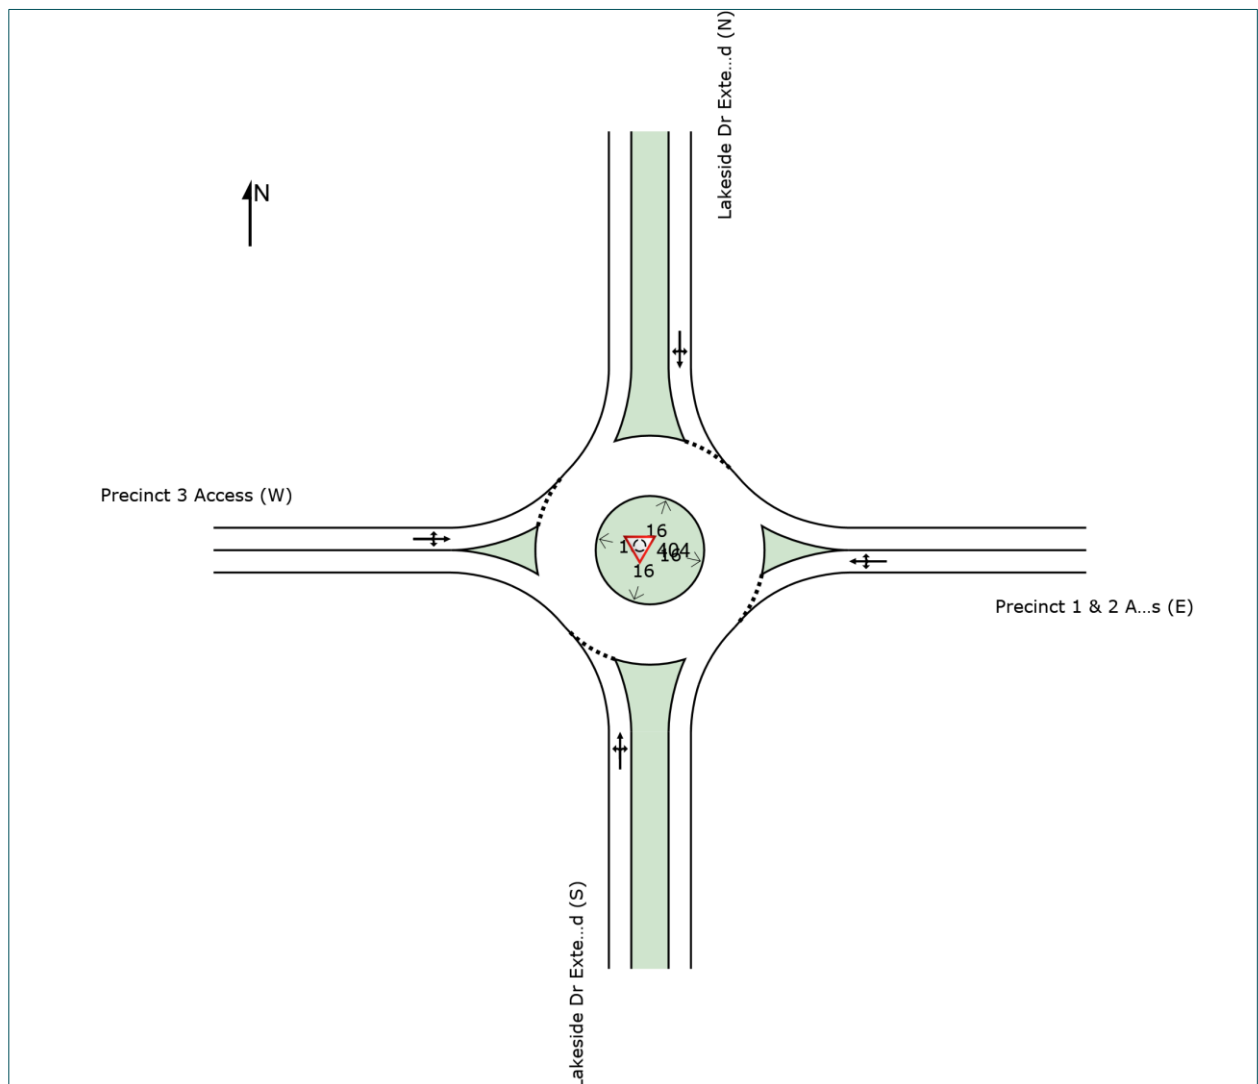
Proposed Lakeside Drive extended / Development Access roundabout SIDRA layout
